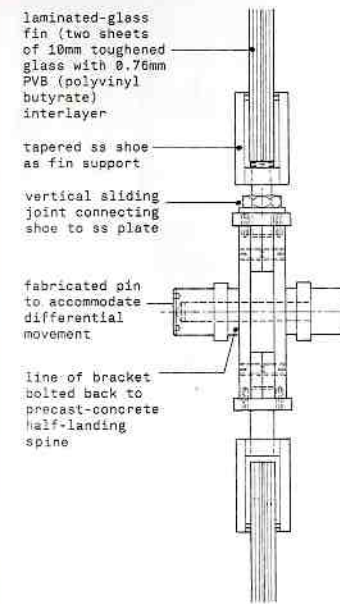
DETAIL SECTION AT GLASS WALL AND LANDING AND PLAN OF GLASS FIN CONNECTION
